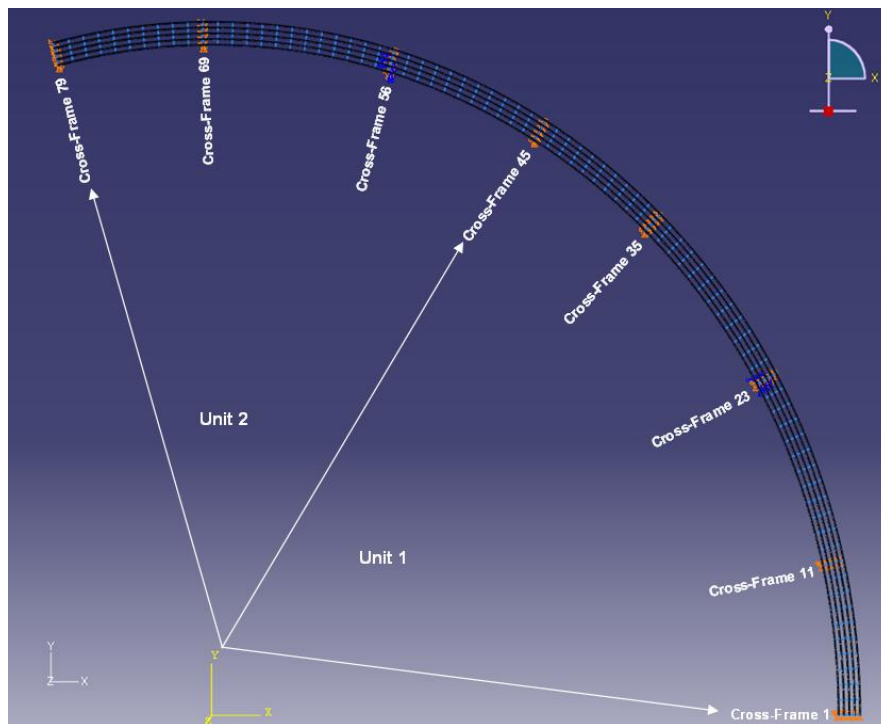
ABAQUS Model Detailing Cross-Frame Labels, Missing Ramps Bridge.
